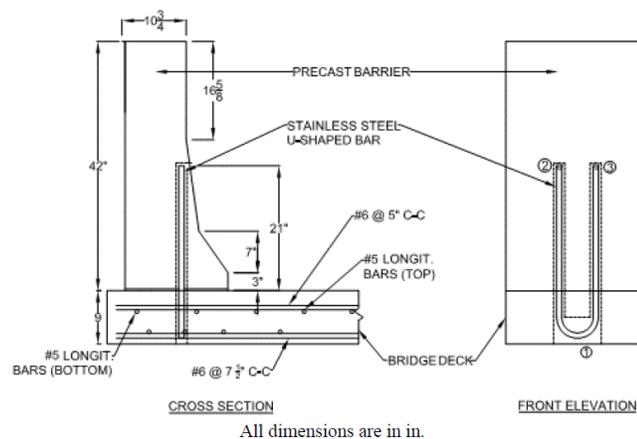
45 U-bar connection between precast barrier and deck [68].
